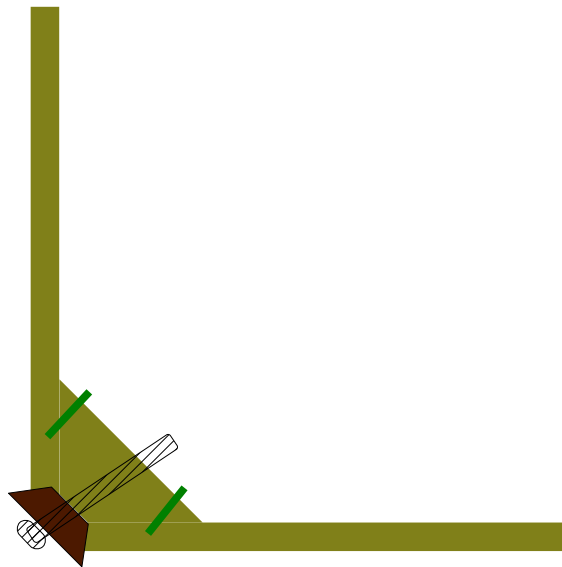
Lining up post to platform to mark position of hole for carriage bolt
